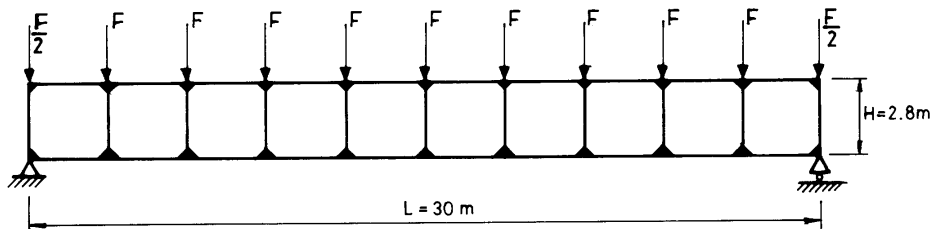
A simply supported Vierendeel truss with parallel chords welded from square hollow section rods
